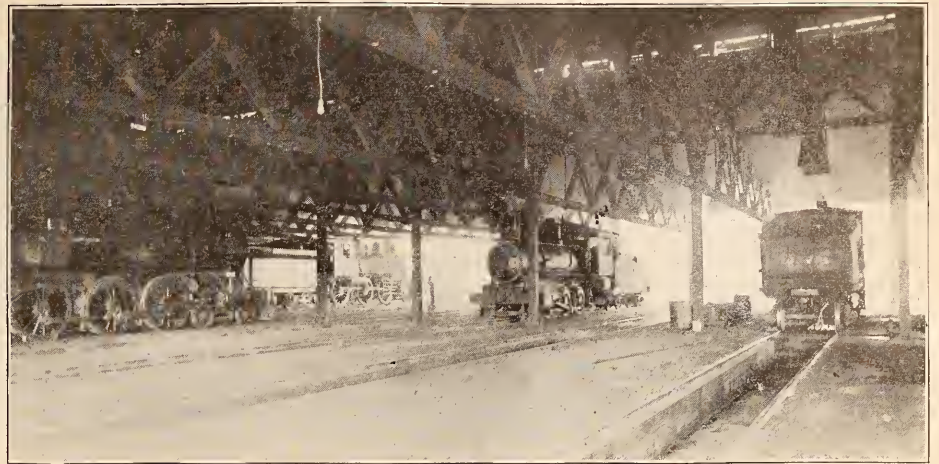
VIEW OF INTERIOR OF ENGINE HOUSE, SHOWING ROOF TRUSSES, DICKINSON SMOKE JACKS AND METHOD OF LIGHTING—T. R. R. ASCN. OF ST. L.
